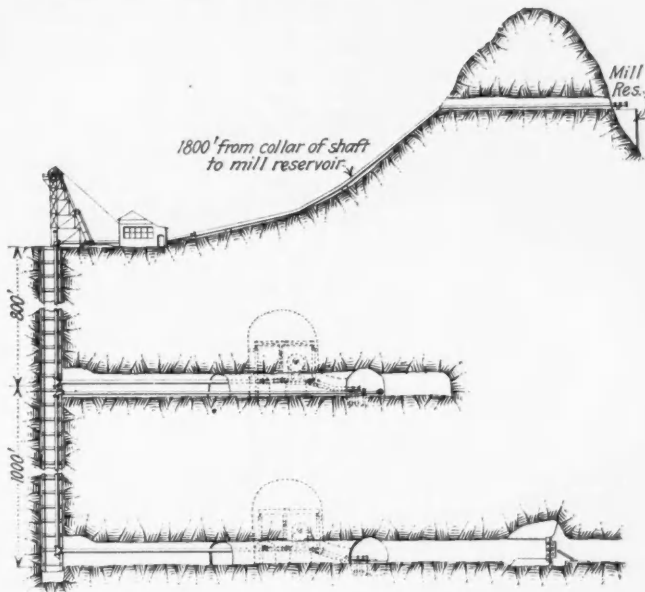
Calumet & Cochise shaft in elevation, showing the 800-ft. and 1,800-ft. pump stations
